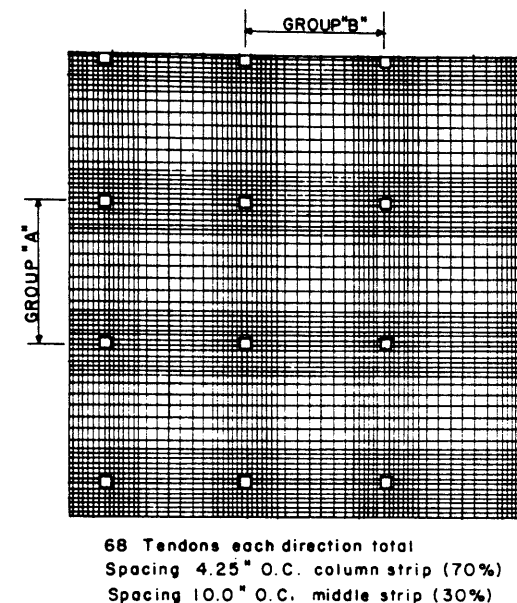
Tendon Arrangement for Test Slab (1 in. = 25.4 mm)
